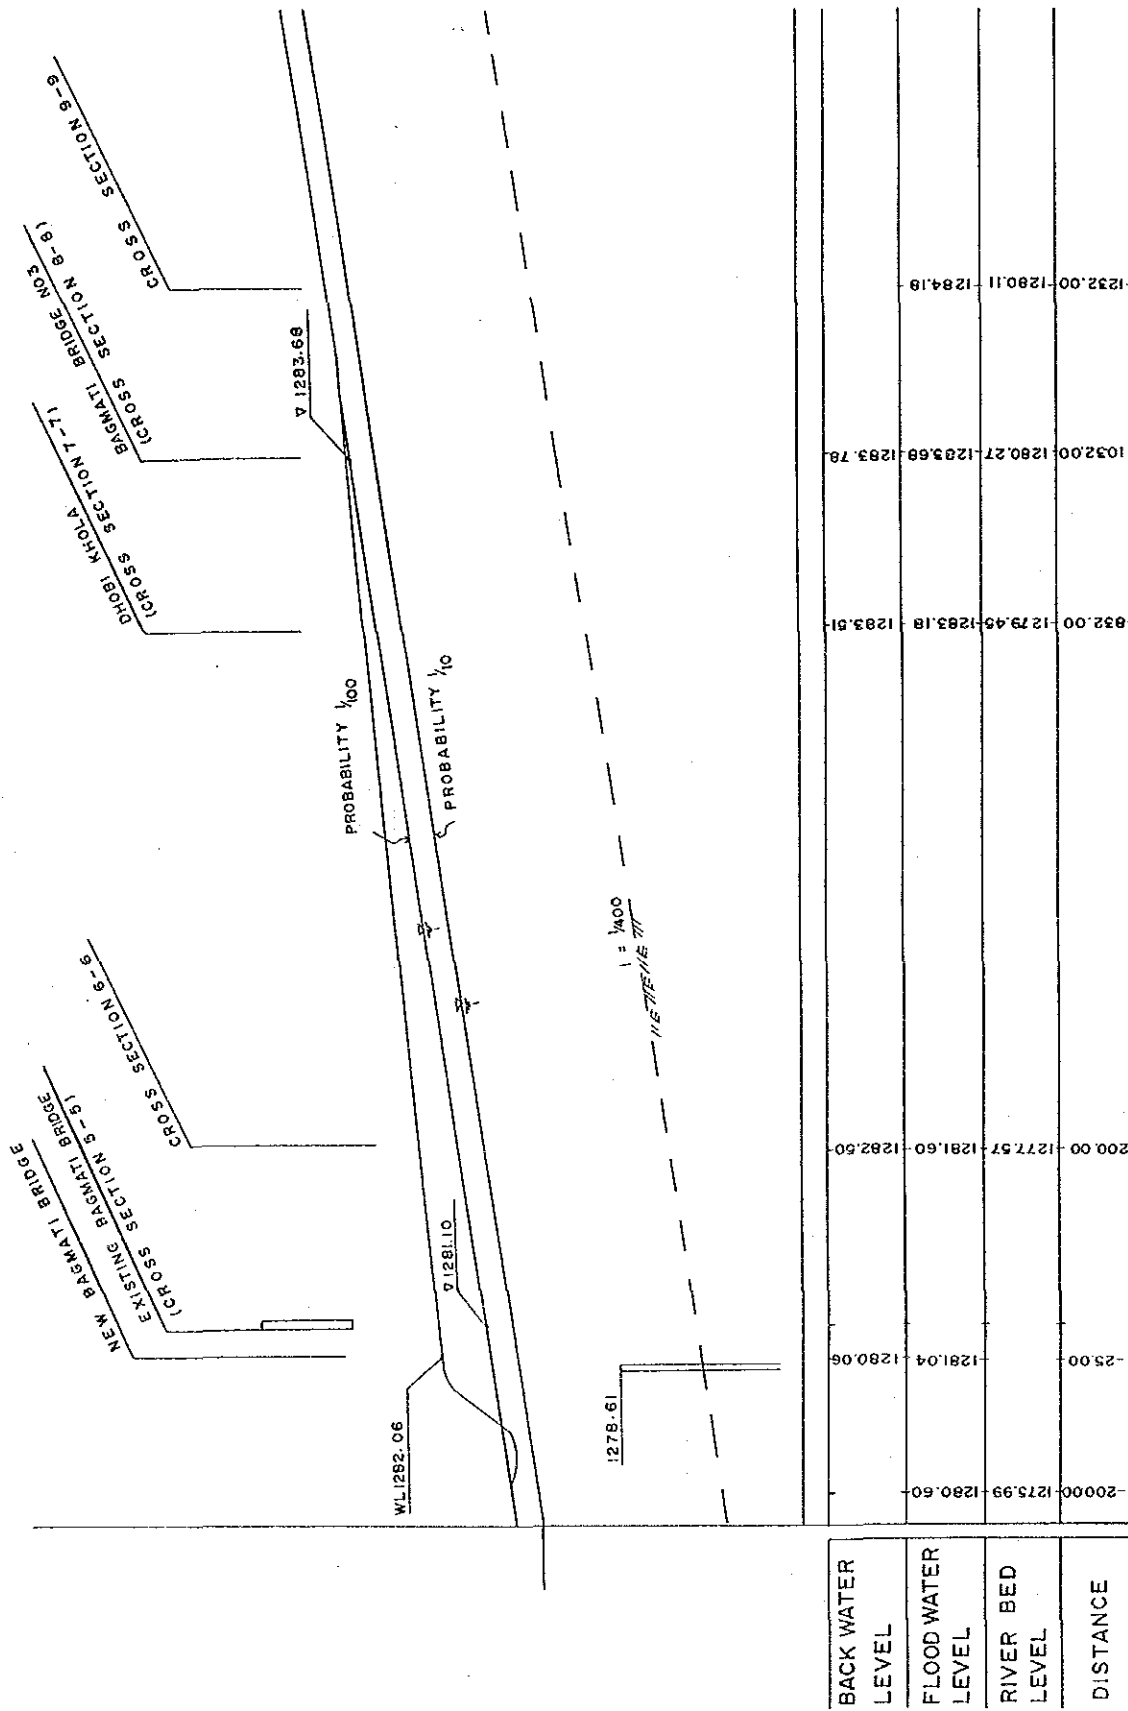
(1/2) BACK WATER BY GROUND SILL AT DOWNSTREAM OF BAGMATI BRIDGE NO. 2
